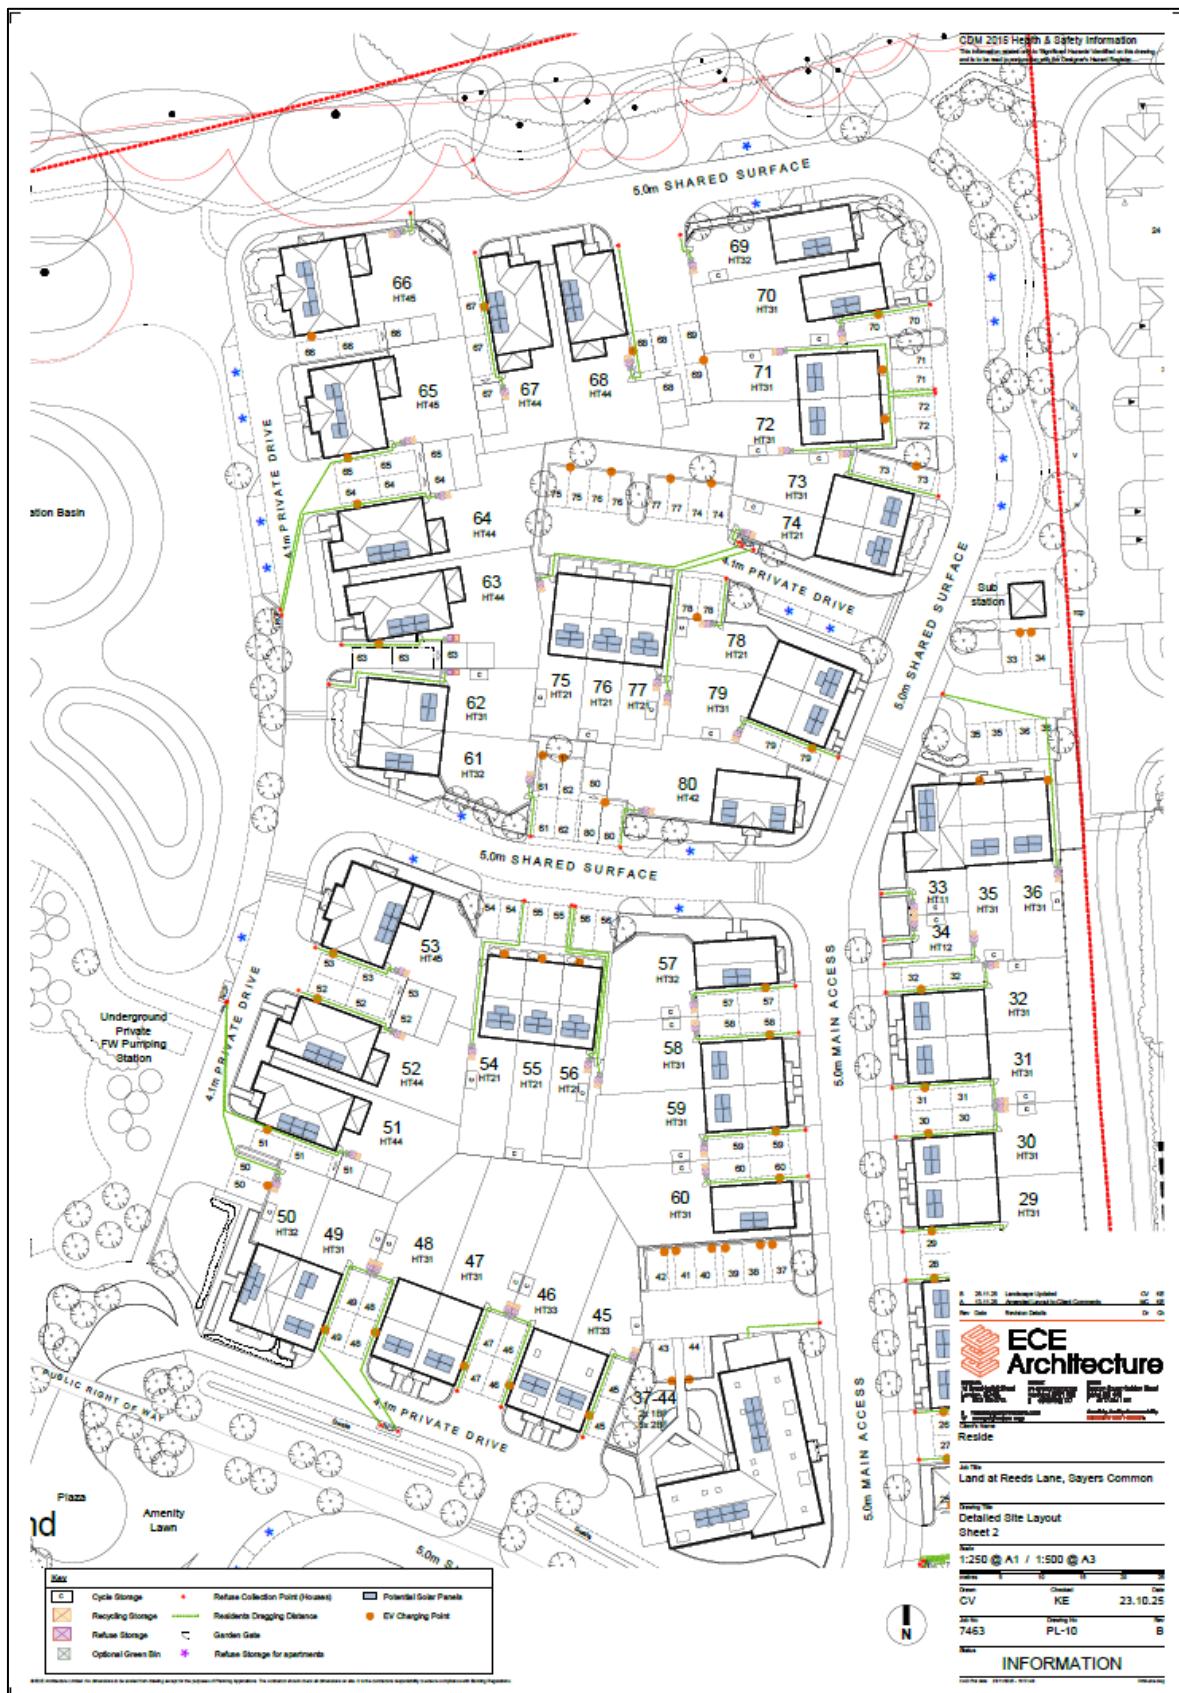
Detailed Site Layout Sheet 2 (ECE Architecture)
